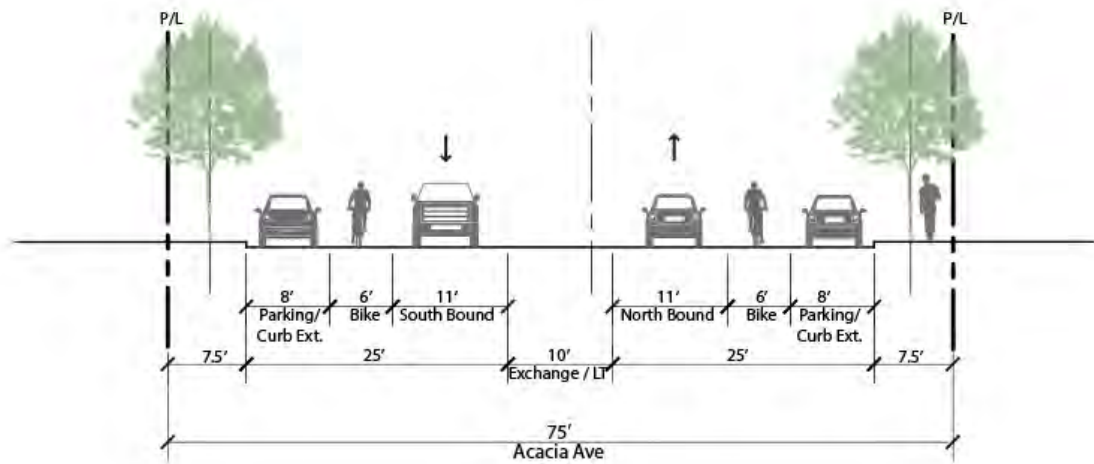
Acacia Avenue Typical Cross-Section, Compton Boulevard to Myrrh Avenue.
